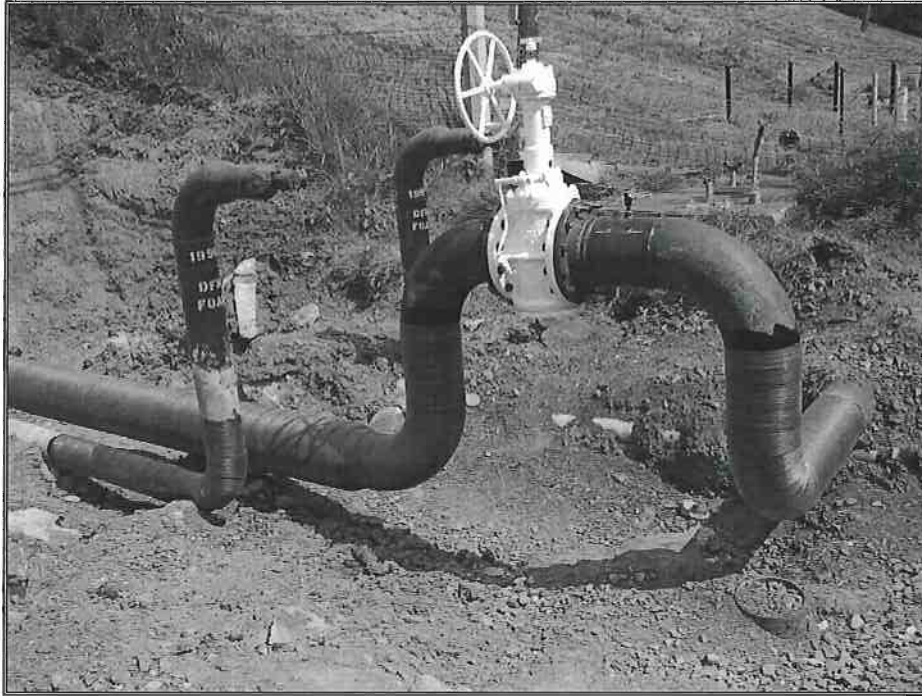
A – Valve Pit 8 Valve Setting Installation DFM Pipeline
